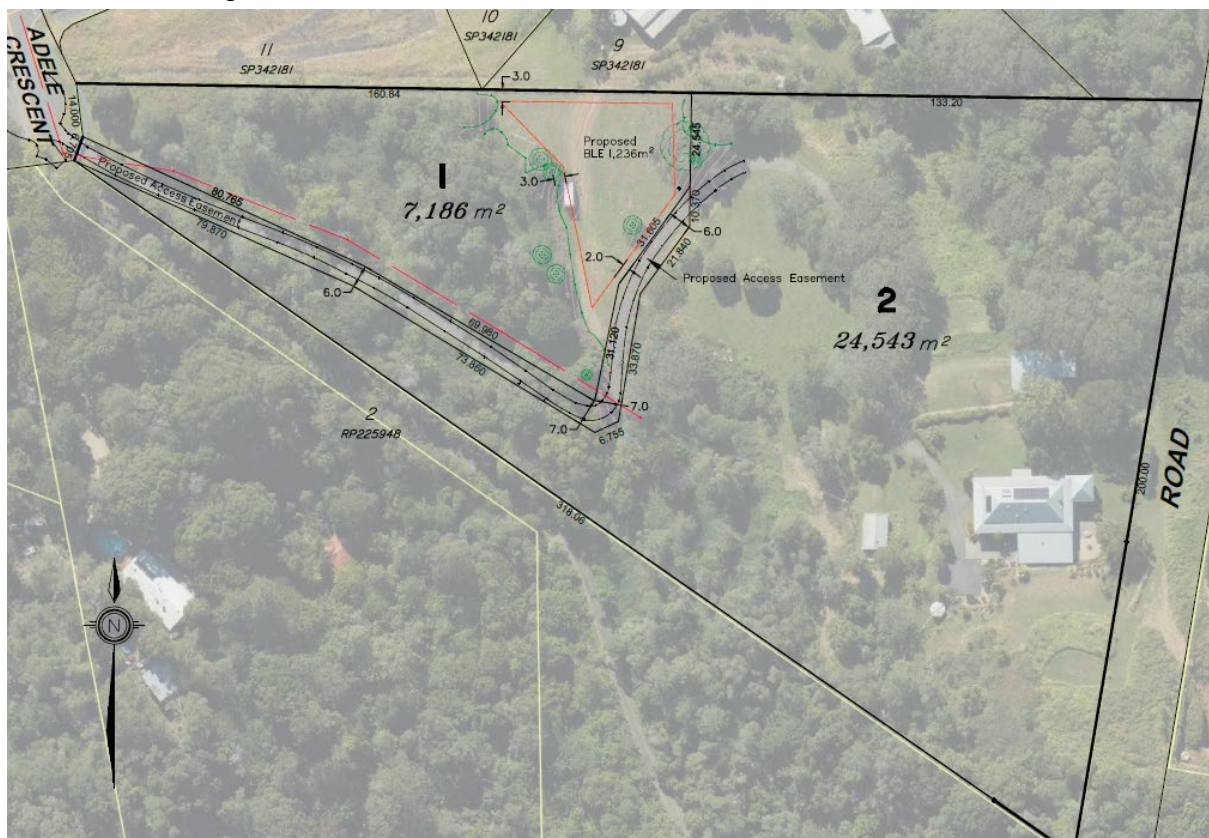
Proposed subdivision plan extract (Source: Appendix A)
